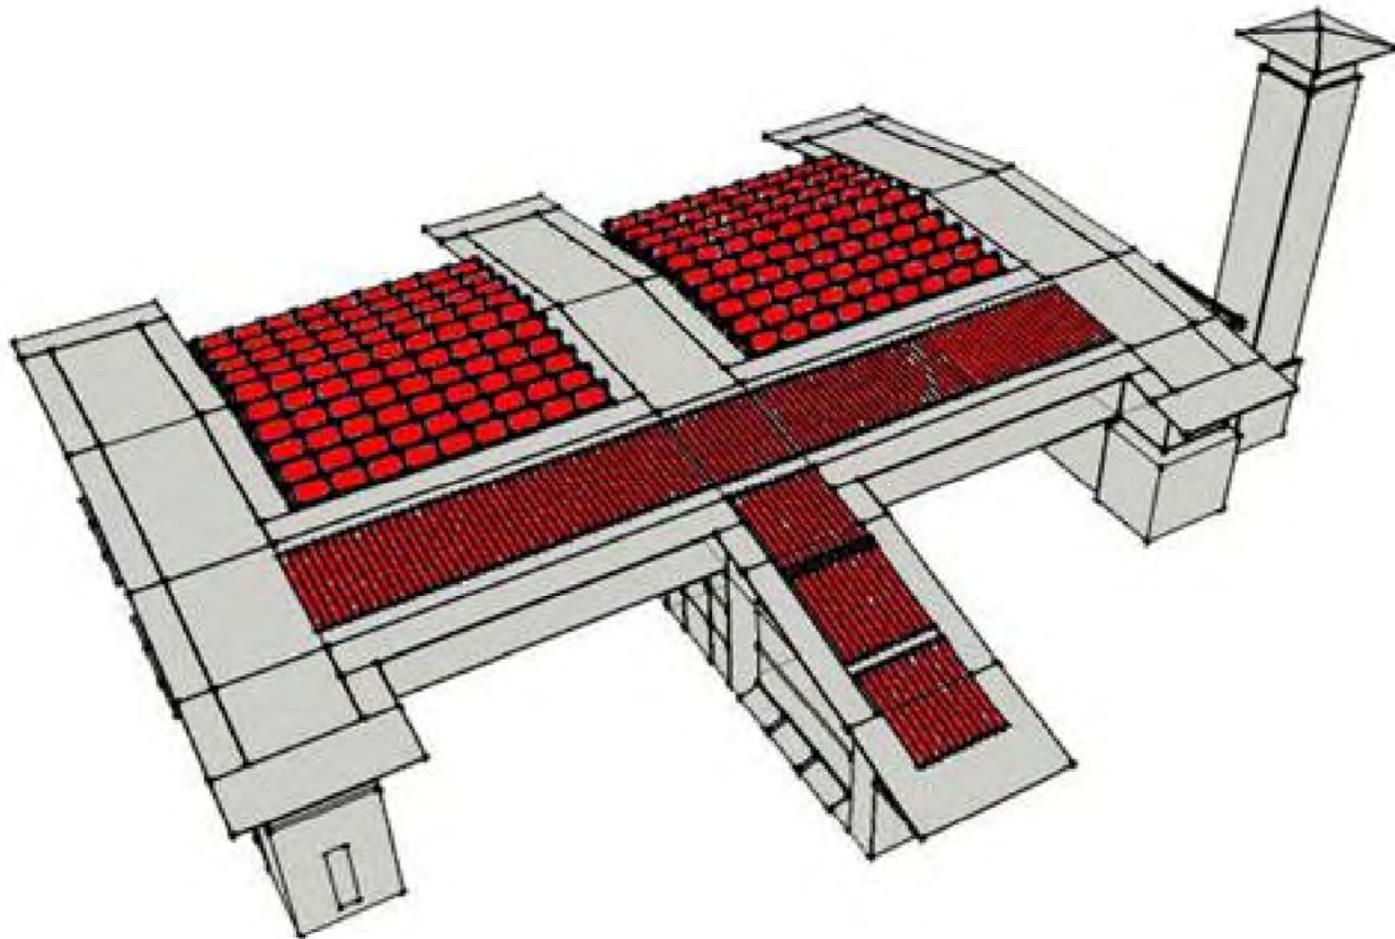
Photovoltaic Panels on Top of Station Building
